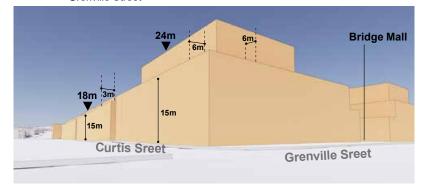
Sub-Area 1: Bridge Mall Gateway view from corner of Curtis Street and Grenville Street
